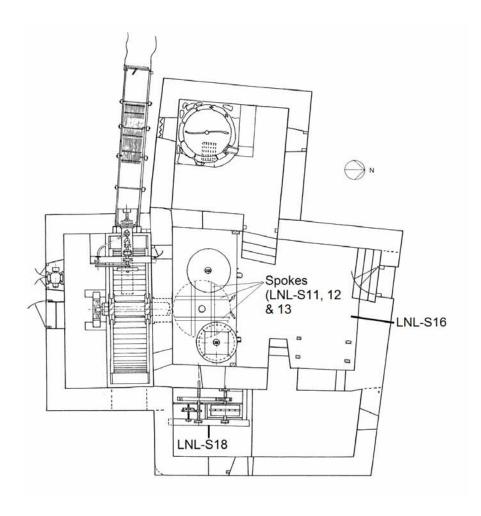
Ground-floor plan of Linnels Mill showing the location of samples LNL-S11-13, LNL-S16, and LNL-S18 (Adult Education Class, University of Newcastle upon Tyne)
